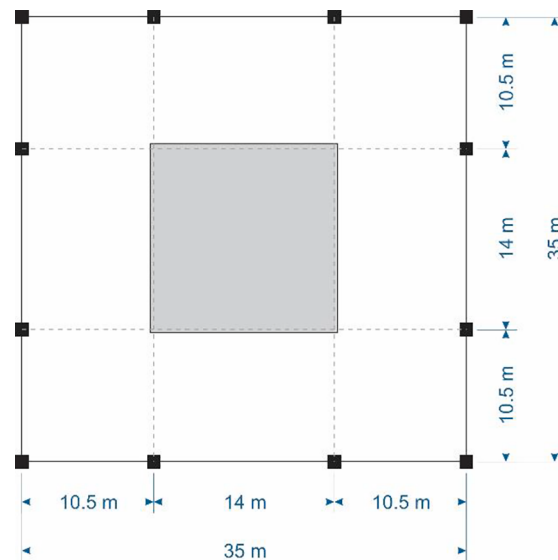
Floor plan of the representative case study buildings in Seoul, South Korea. Adapted from Sang Kim et al. [71].
